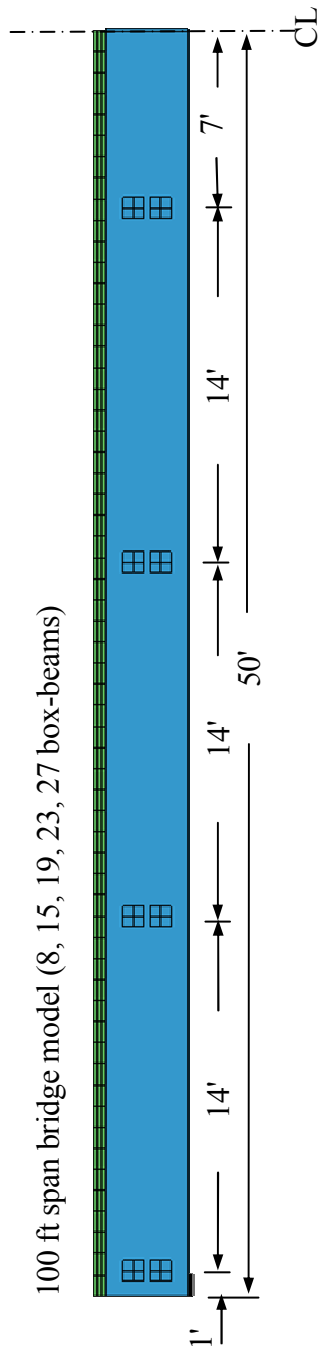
Bridge models generated using 36 in. wide box-beams (spans).
